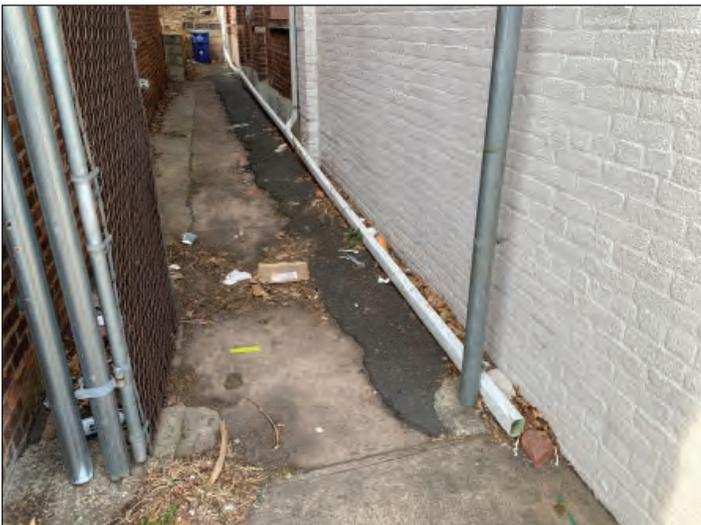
Downspout/drain pipe extending length of alley, opening toward sidewalk.
